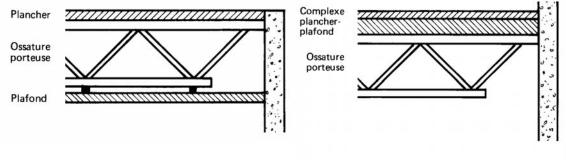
Concealed steel framework situated in a heated space. Framework floor supporting deck and ceiling
